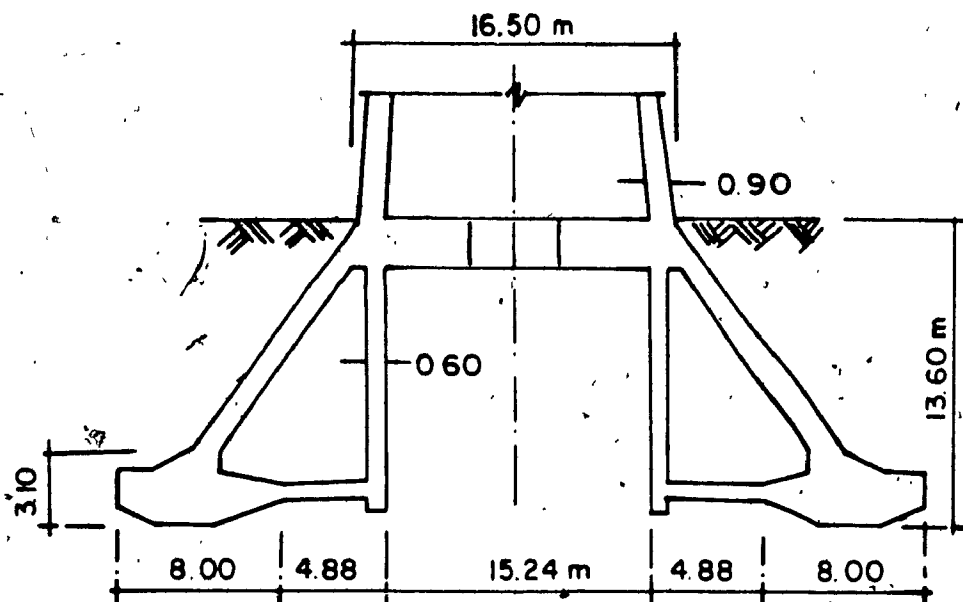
Shell Foundation of Telex tower -Hamburg, West Germany 1967
